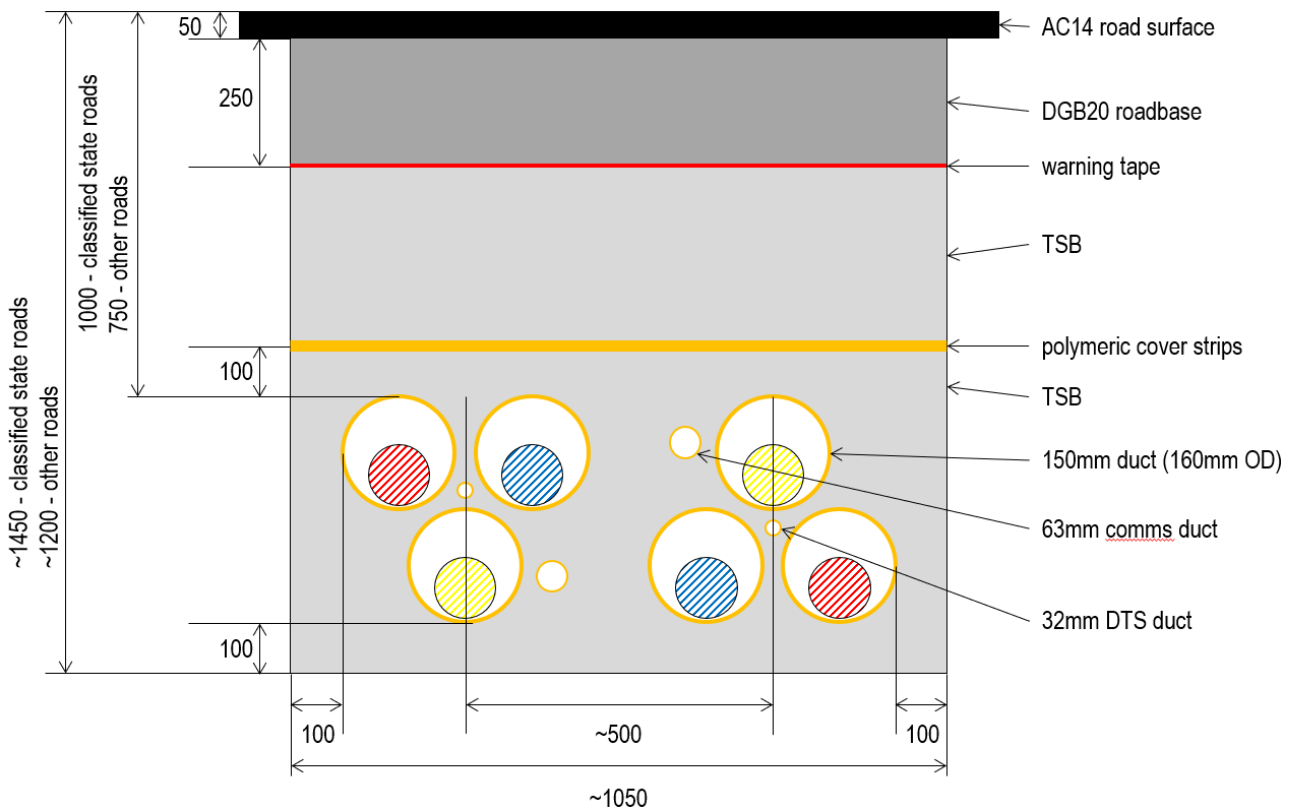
Typical trench cross section - double circuit 132kV single core cables using 150mm ducts
